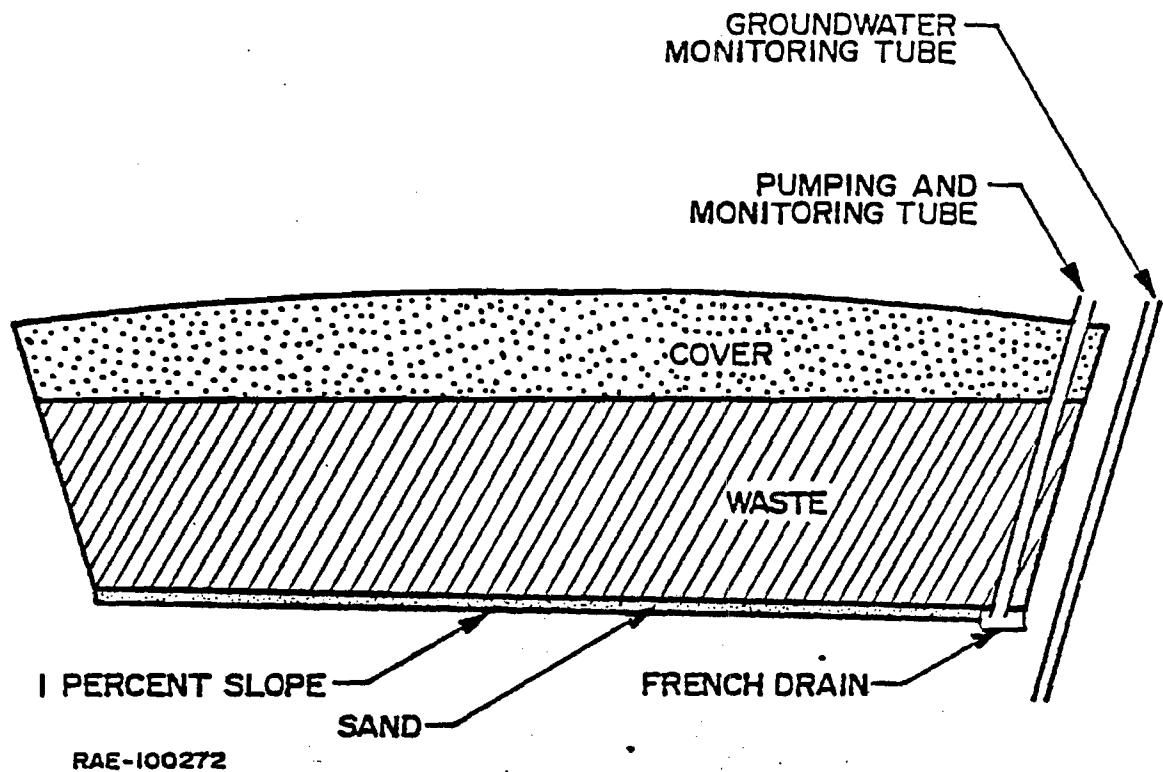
a. CROSS SECTION OF TYPICAL TRENCH
